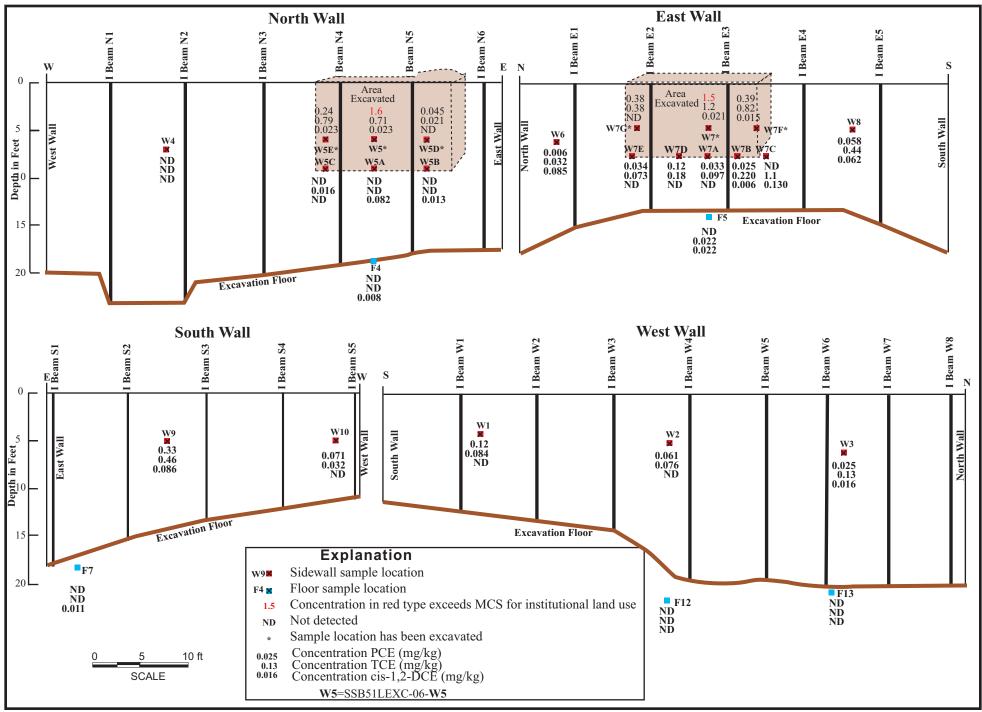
Building 51L Corrective Measures Excavation Sidewall Sample Locations.
